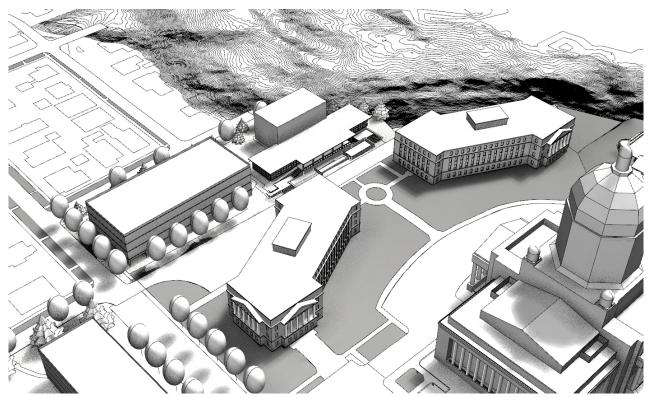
ALTERNATIVE 5.D - OFFICE BUILDING ON PRITCHARD PARKING LOT
